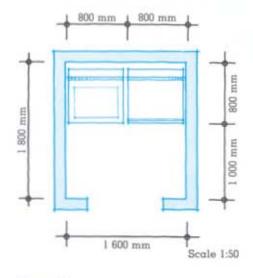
Typical plan illustrating minimum dimensions for laundering space. Net area: $2.9~\mathrm{m}^2$
